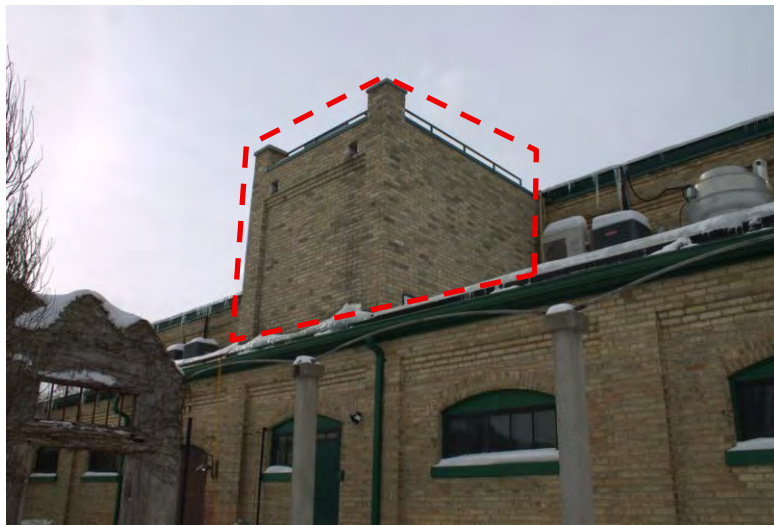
View of east elevation noting contemporary addition (MHBC, 2026).
